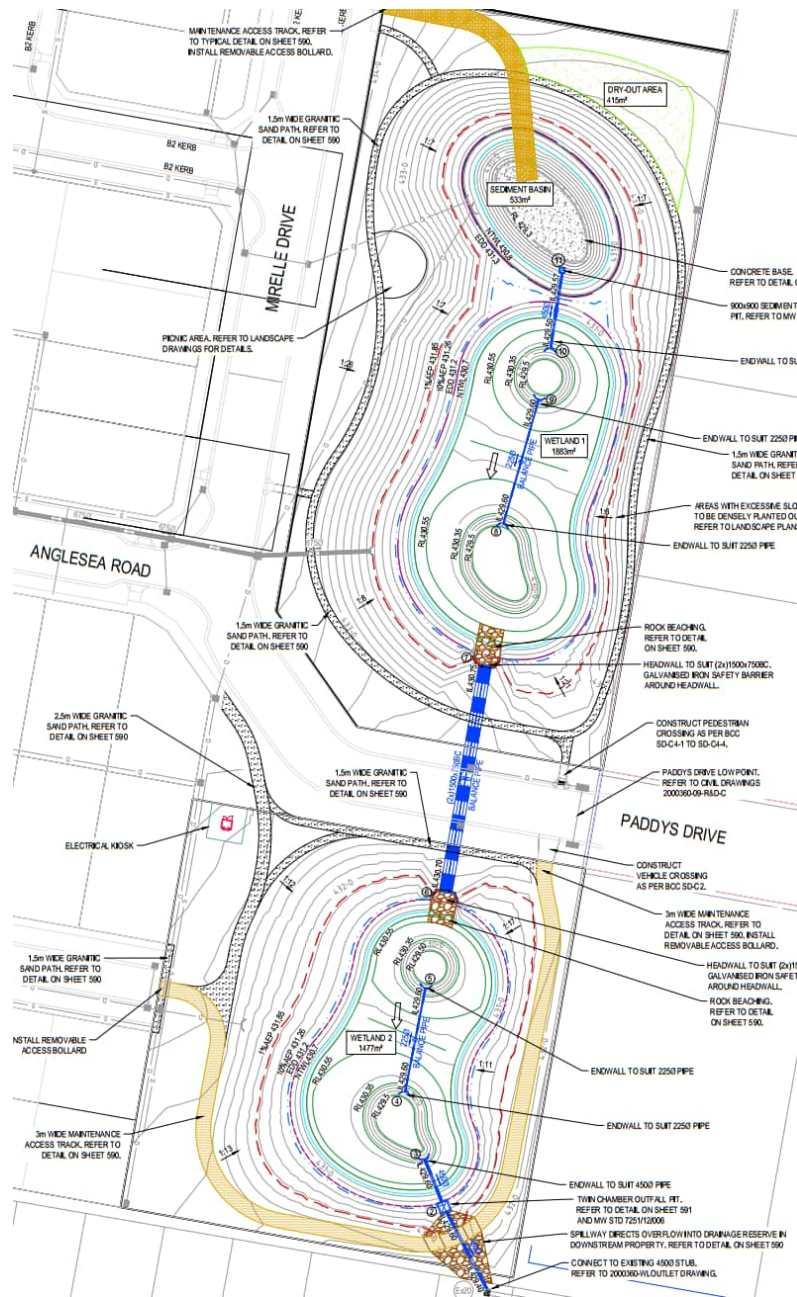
RETARDING BASIN 5 LAYOUT
